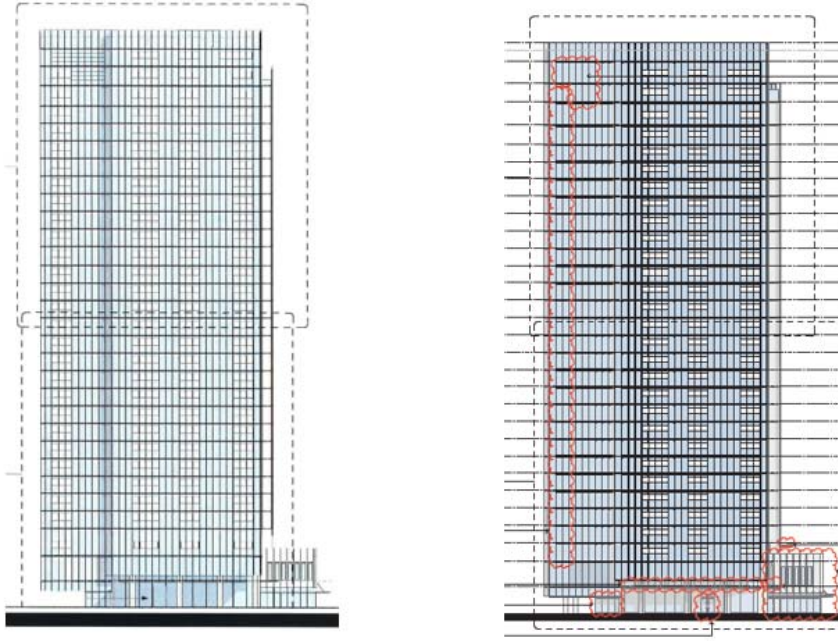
| Hickson Road elevation approved (left) proposed (right) (Base source: Applicant's Architectural Package)
